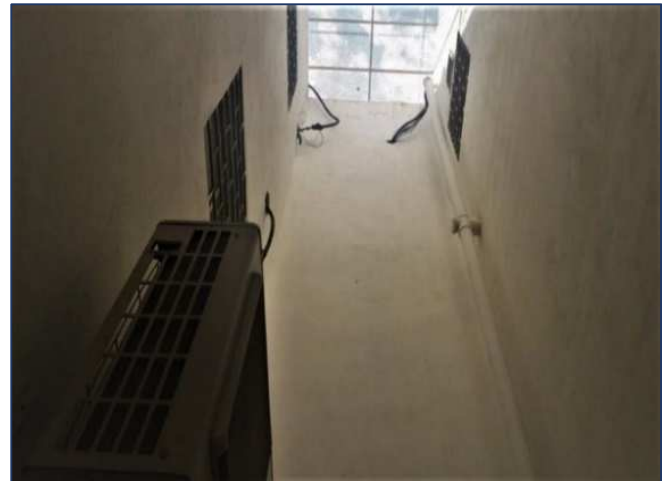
Installing plumbing lines and outdoor air conditioner units inside the air shaft
